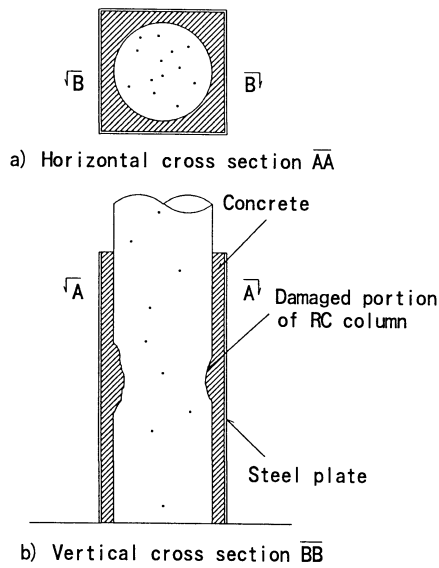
Emergency repair for damaged concrete pier.
